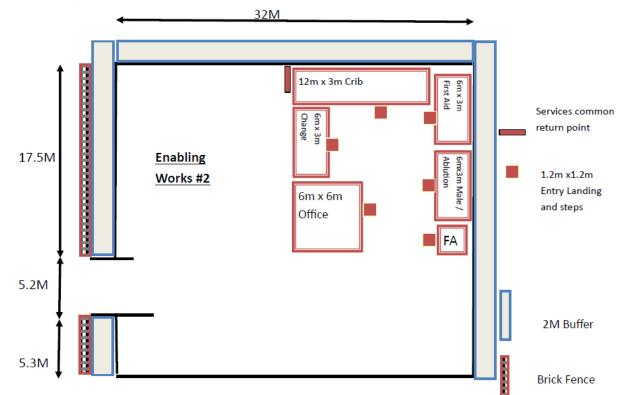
Location plan of the ETP Stage 1 site office and welfare facilities
